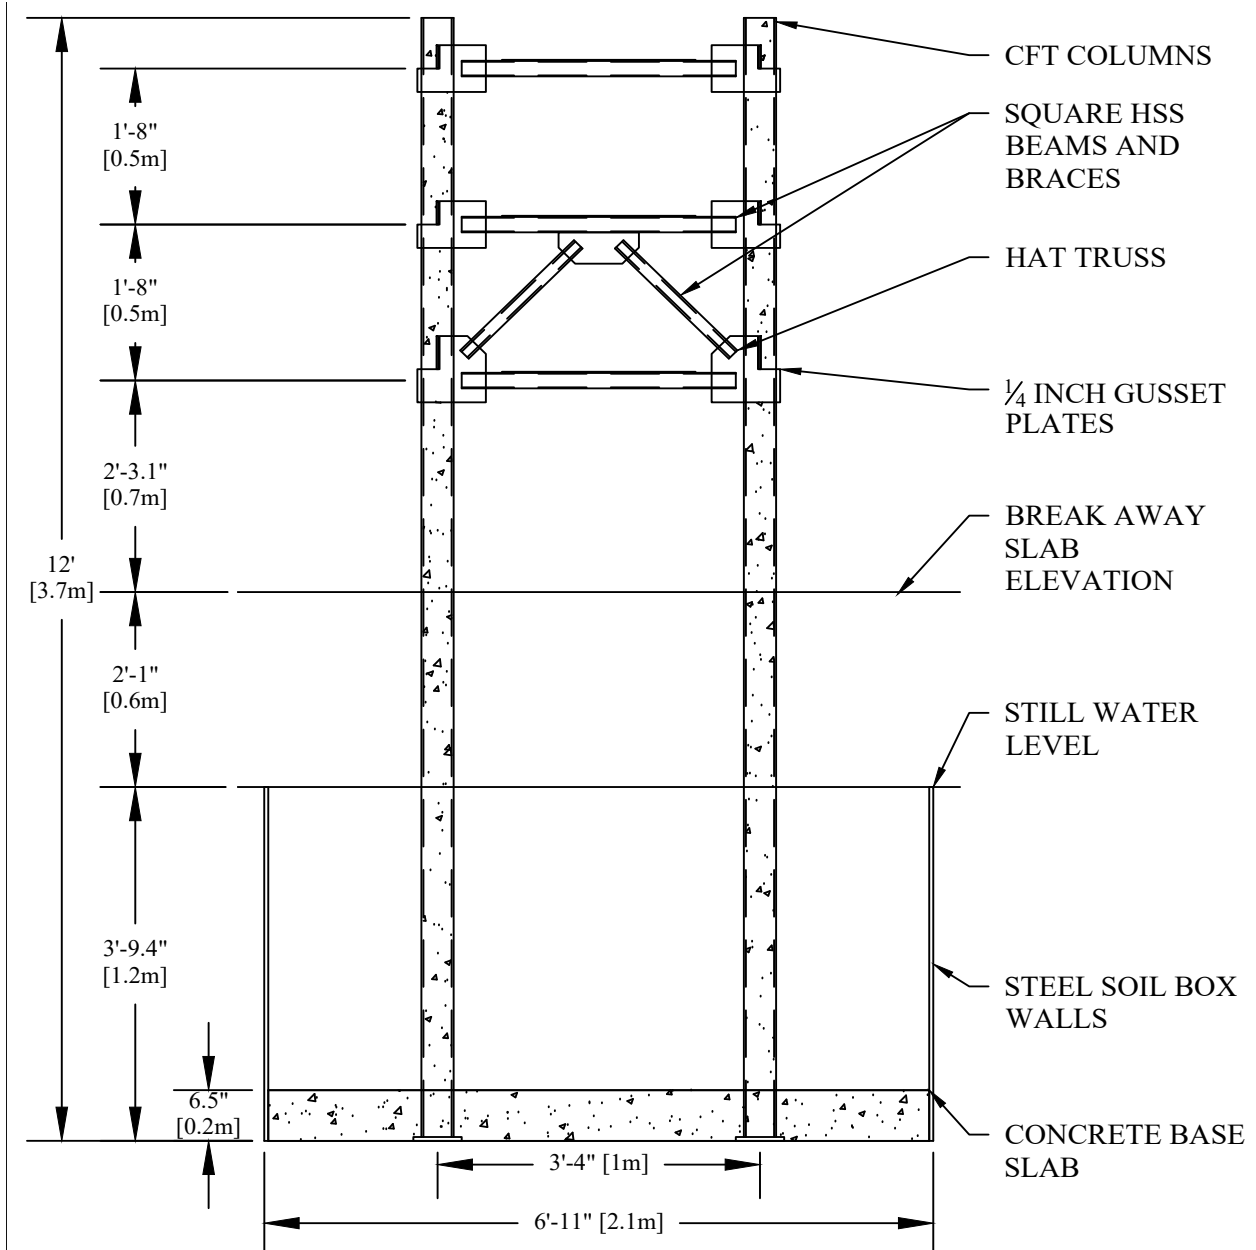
Specimen Elevation. Wave flows in flume from left to right.
